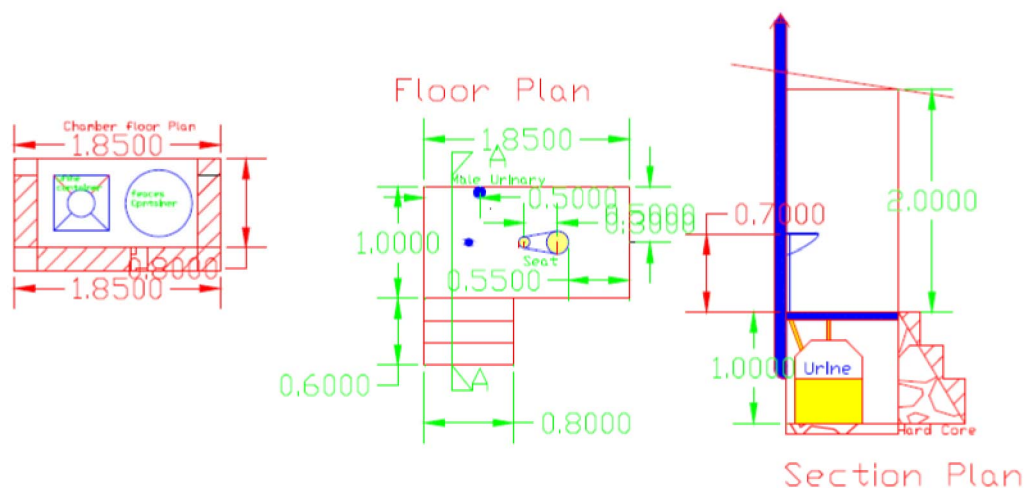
The floor and Section plan for Agafari's UDDT (ROSA Arba Minch; 2009)
